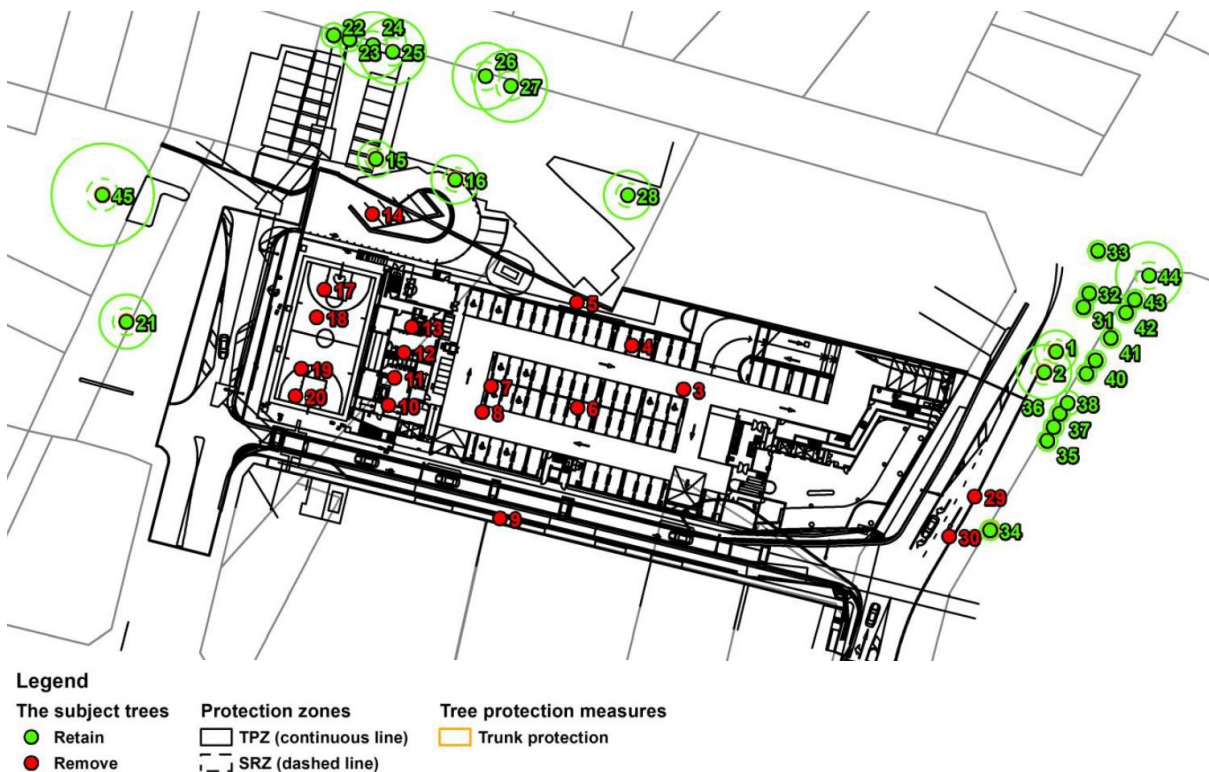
Extract of tree removal plan (Source: Tree Survey, Applicant Arborist)
